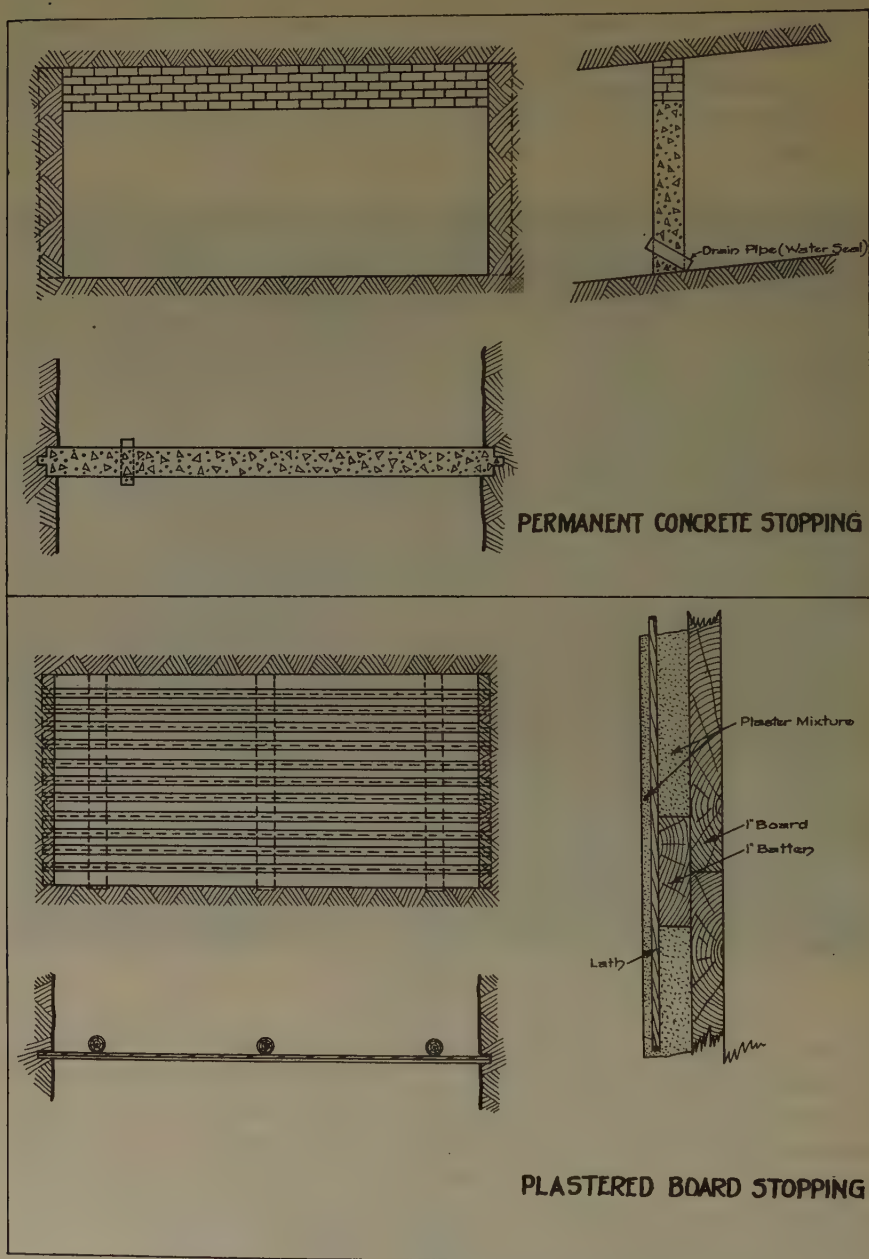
TYPICAL CONCRETE STOPPING BUILT ONLY IN MAIN AIRWAYS.
